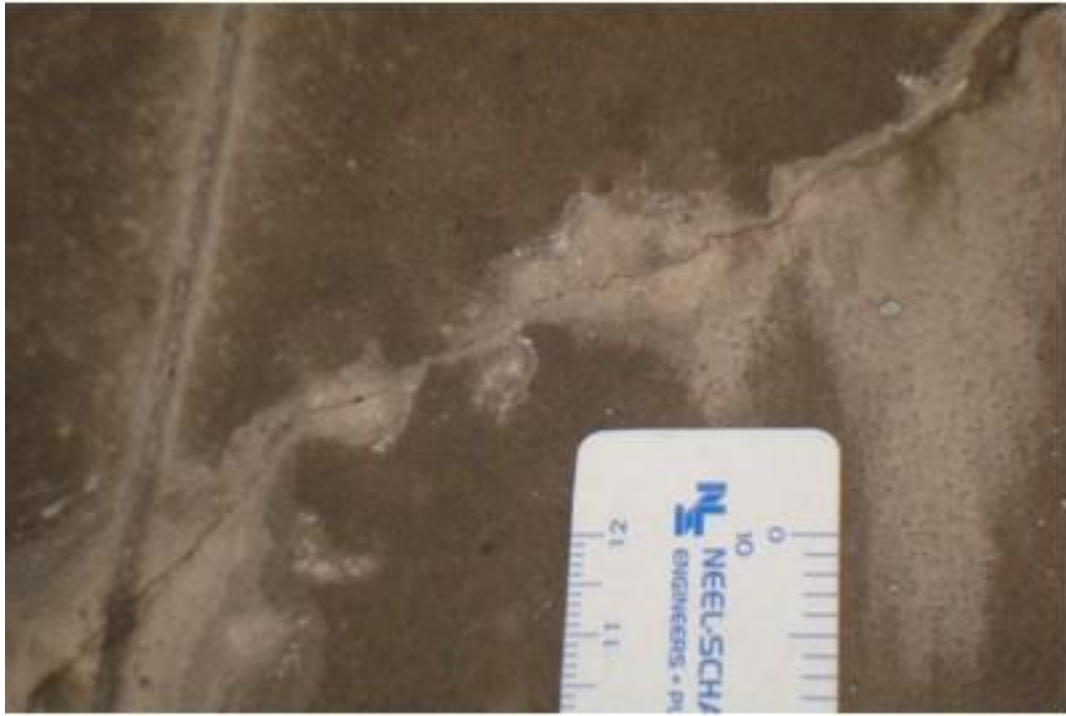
Cracks on south span girder, exterior beam, west side, interior face (#7933).
